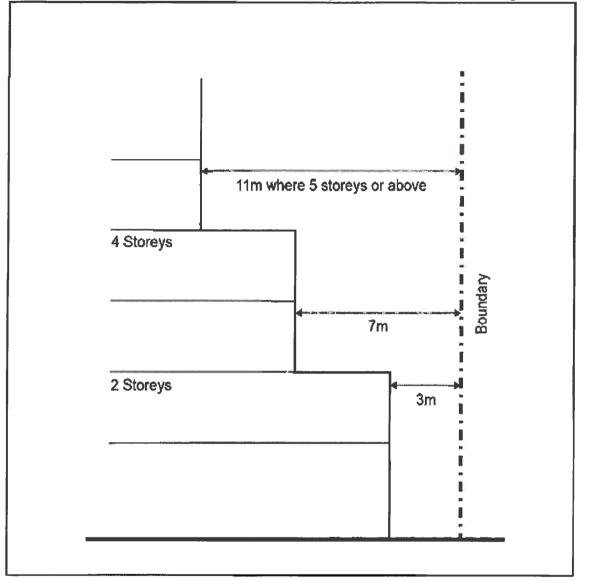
Building setbacks adjoining Mixed Housing Suburban and Mixed Housing Urban zone sites
